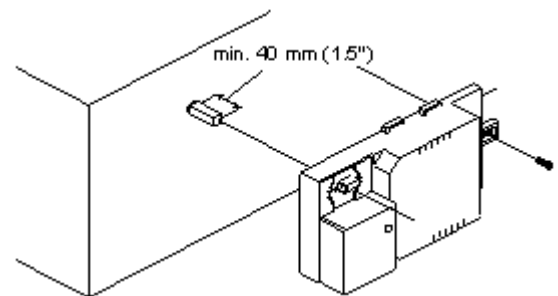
Mounting a VAV or VVT Device on a Damper Shaft
